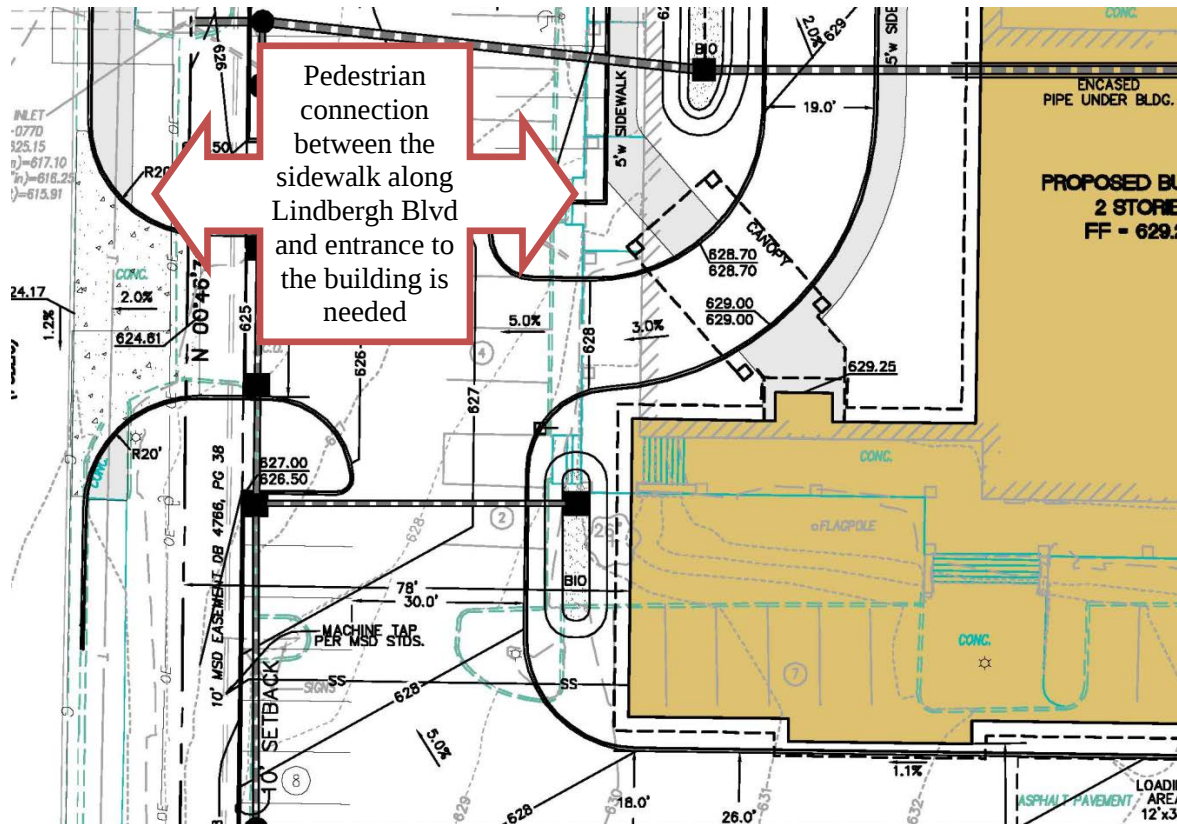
Close-up of the Site Development Plan of the along Lindbergh Blvd.
